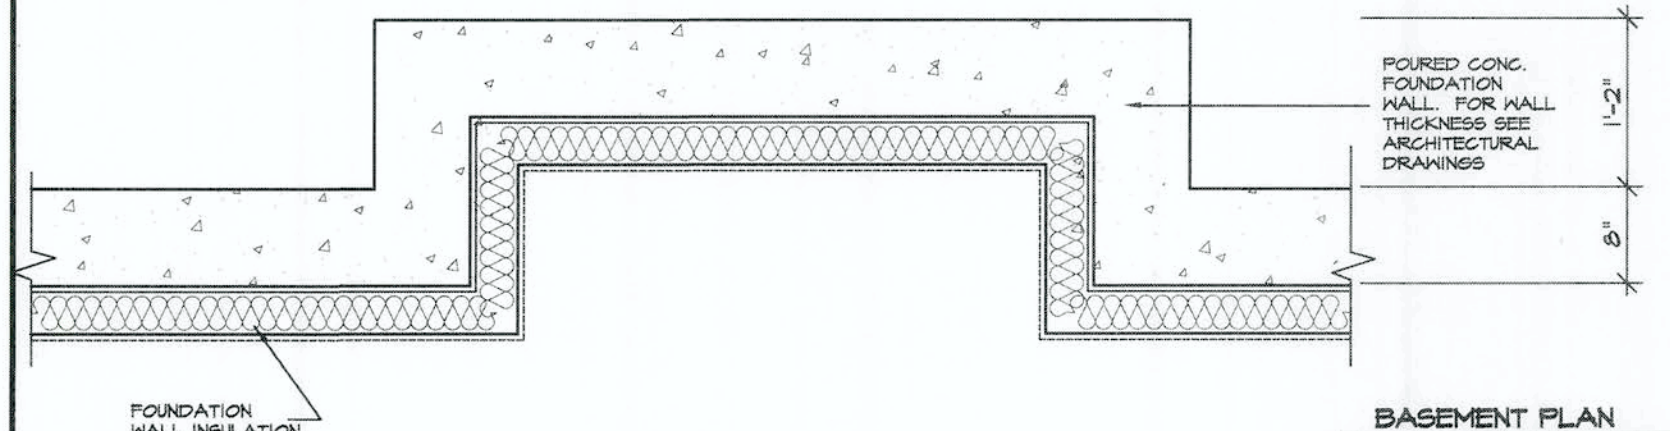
DETAIL FOR CONCRETE VENEER DROPPED GRADE
